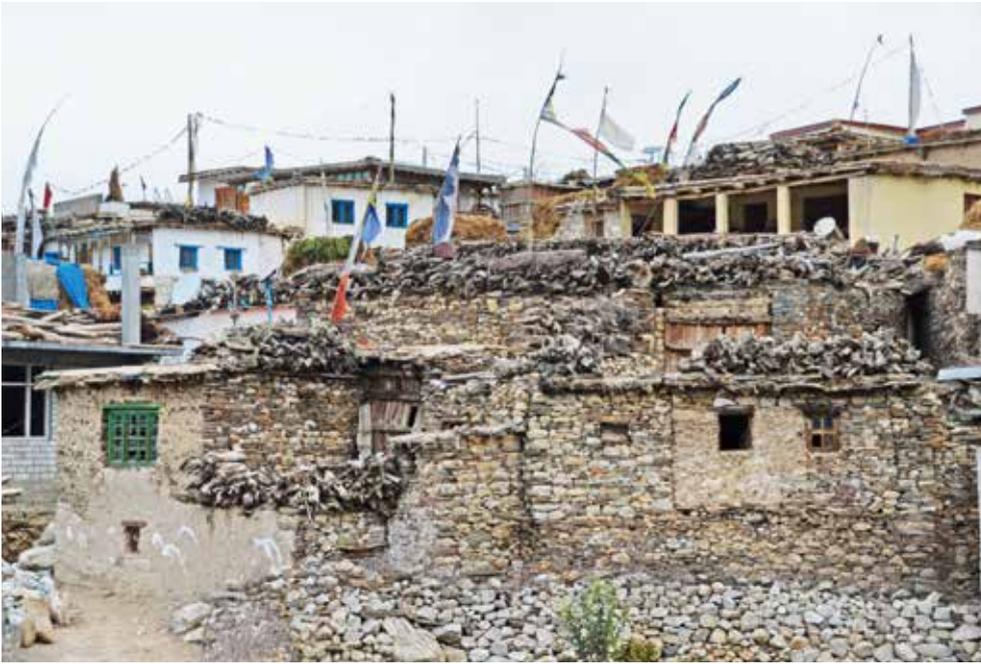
House Type 2, Dharam Singh House, southeast facade.
